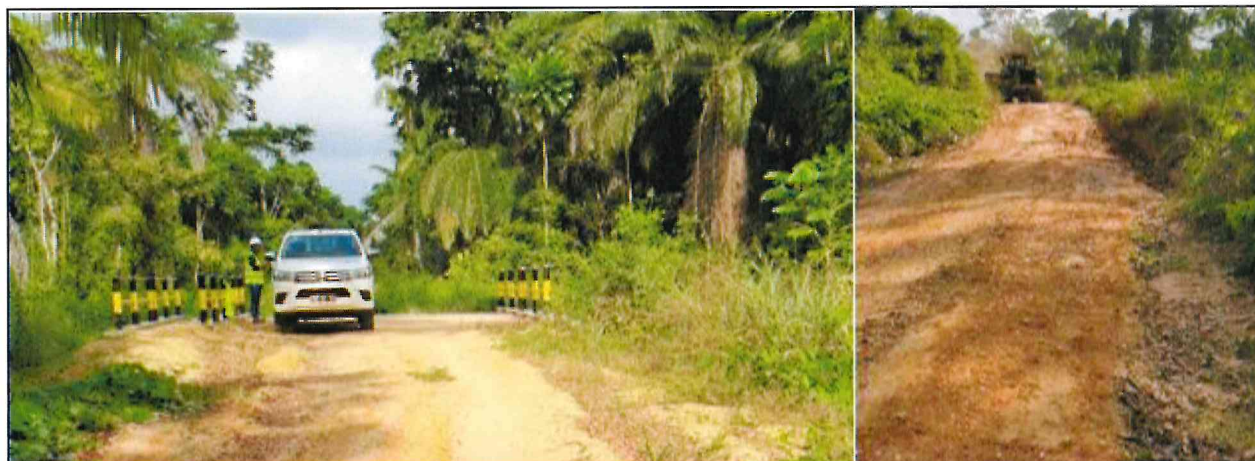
Site access roads to the Cácata mine site being re-grated and upgraded.
